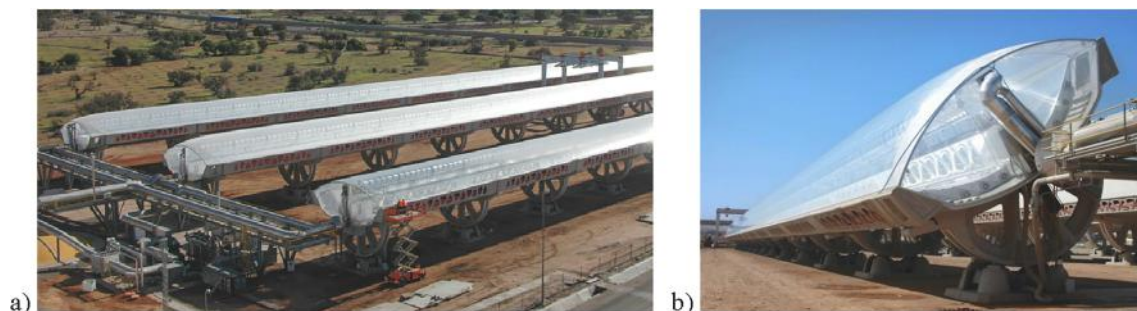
a) Deployed Airlight collector in the pilot plant Ait Baha, Morocco, 2014, b) Wide and enclosed aperture of the collector with its body structure made of precast concrete elements (Airlight Energy, 2015a,b).
